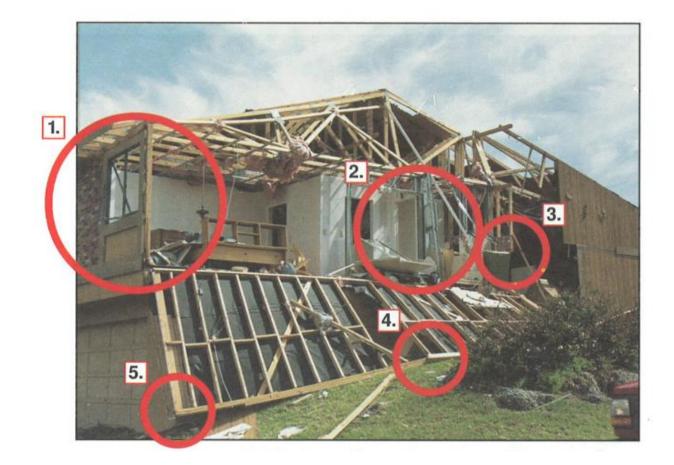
Failure of non-loadbearing wall. Connections of exterior wall were not adequate.
